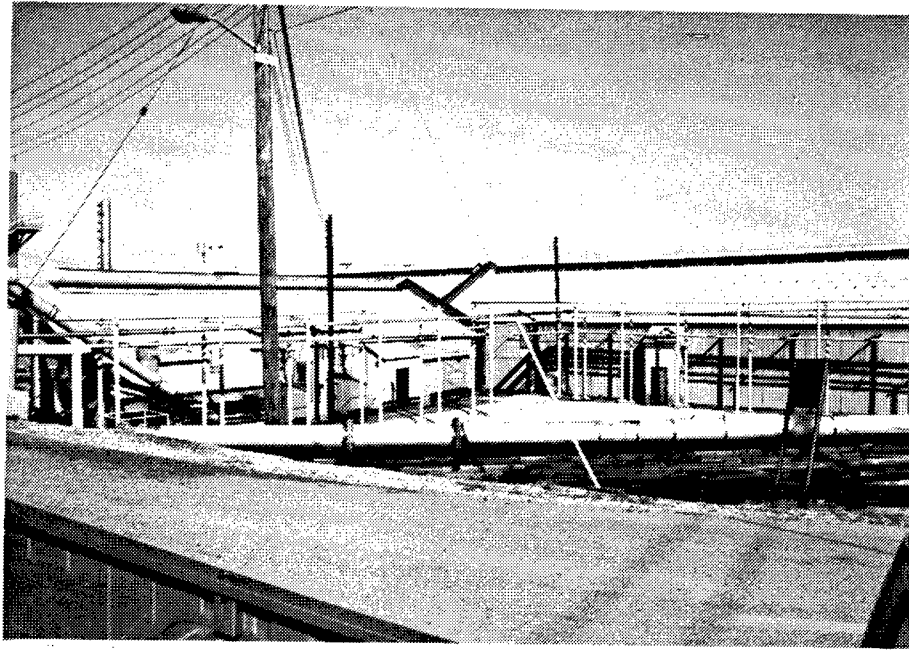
Building 1010: Cotton Dry House and Conveyor Building. In this building, bales of cotton were broken up, dried, and sent to the Nitrating House via the Cotton Dry Conveyor.
